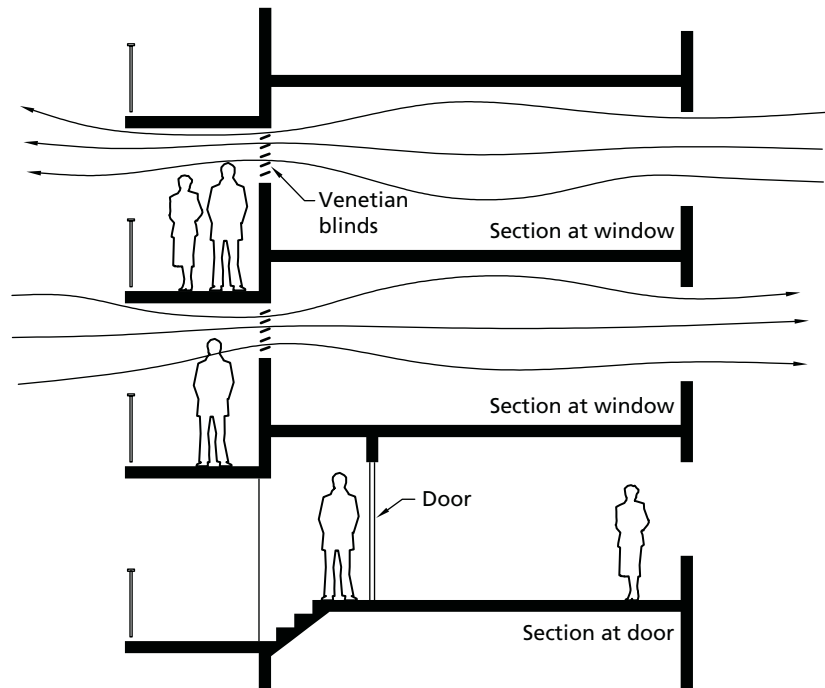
c By dropping the outdoor corridor several steps below the apartment floors, privacy is improved while maintaining cross ventilation.
